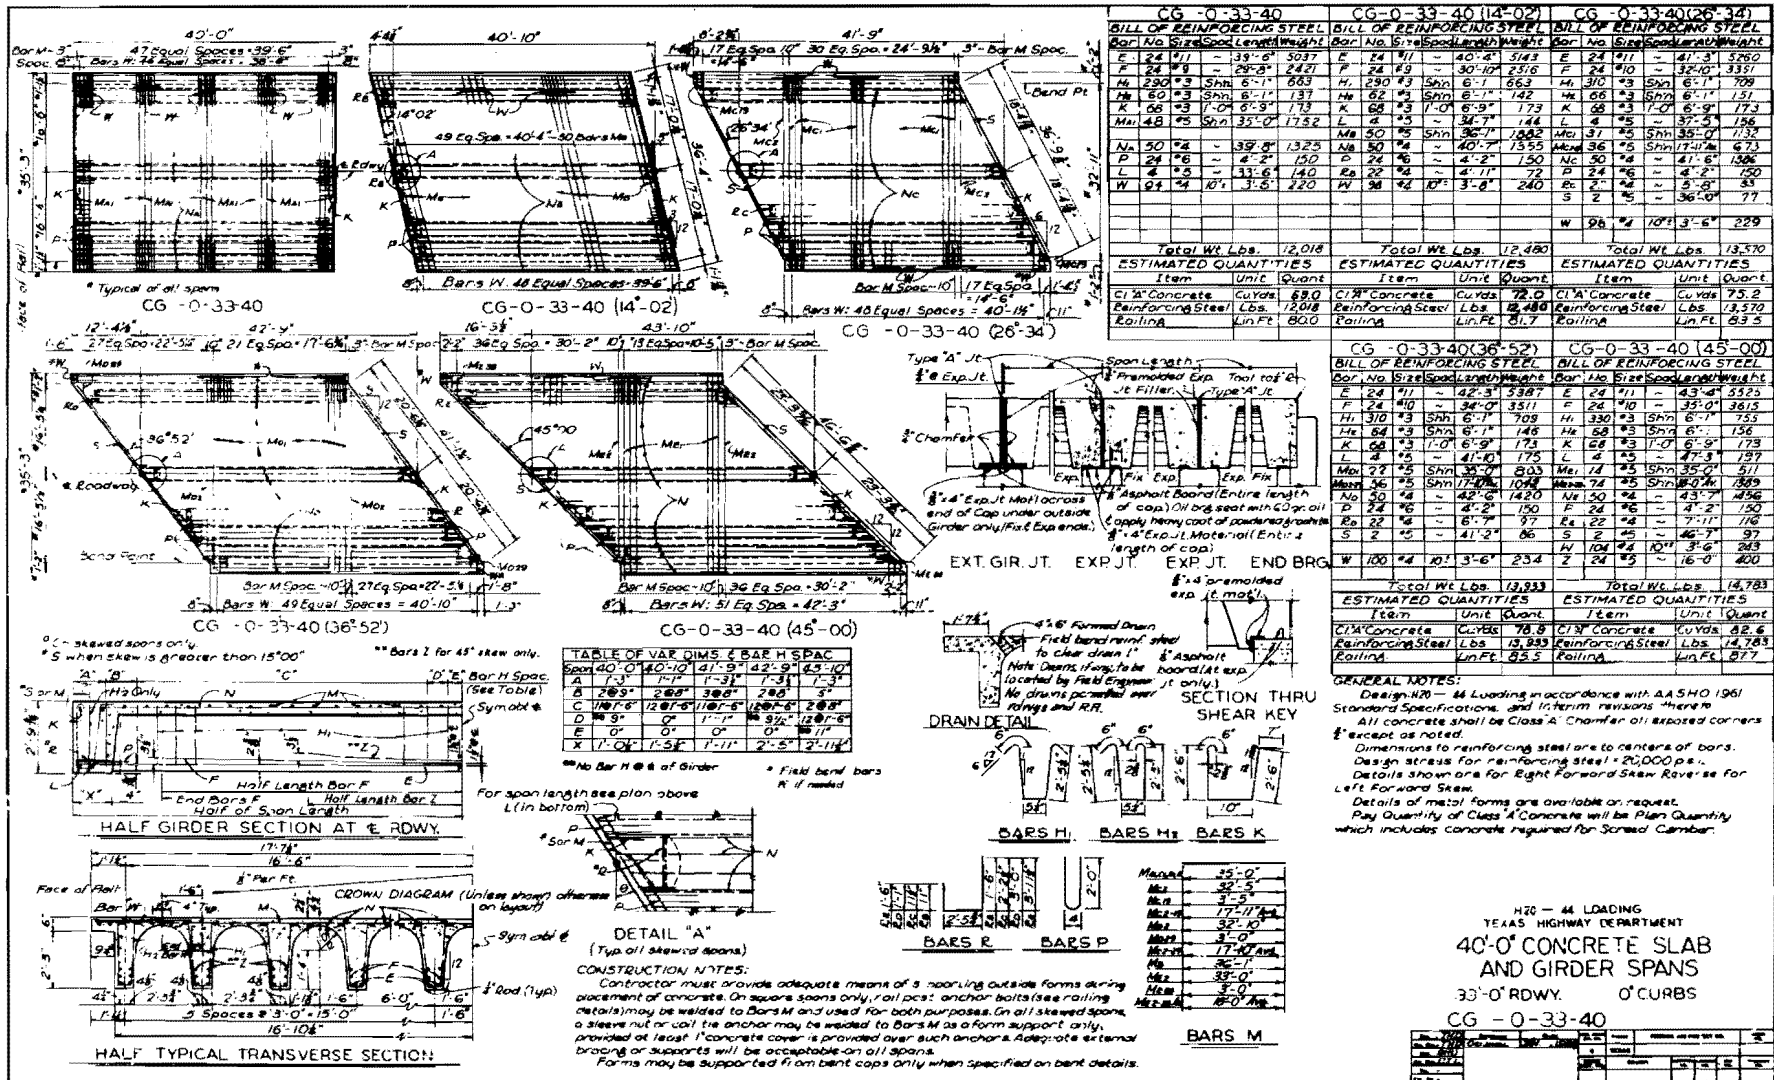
Texas Highway Department Plan Sheet, CG-0-33-40.
